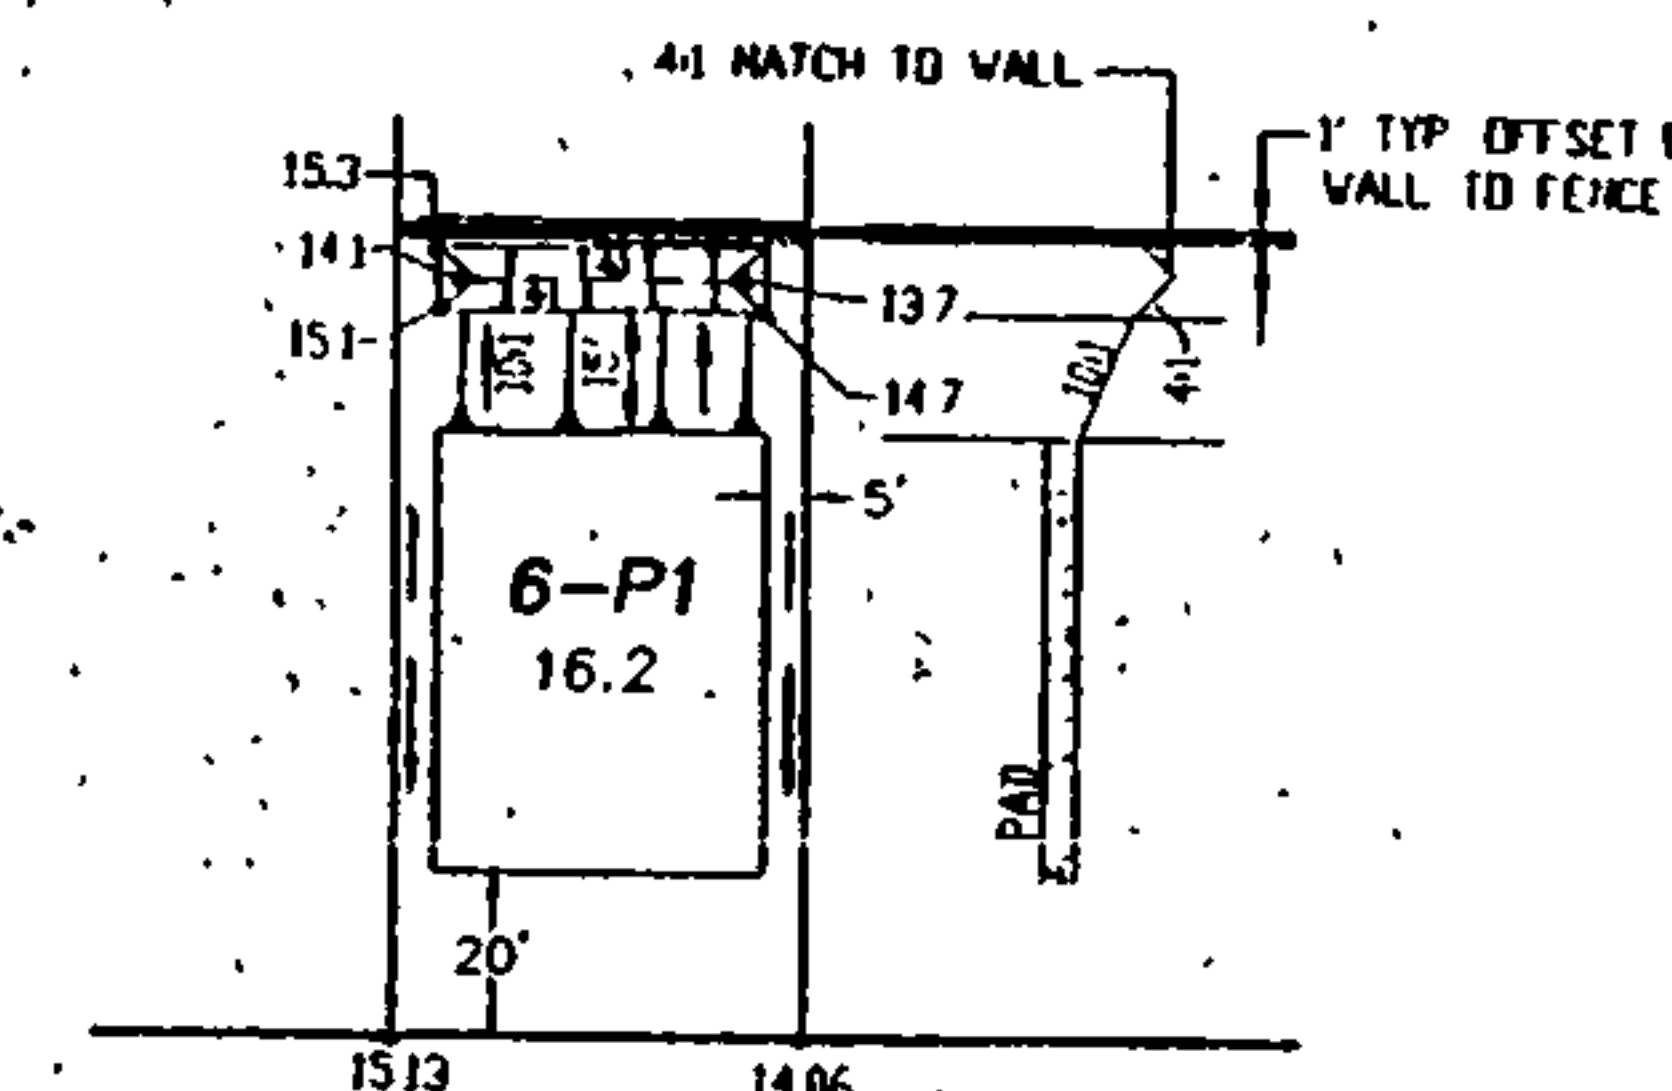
PRELIMINARY GRADING AND DRAINAGE PLAN FOR PARKWAY UNIT 7 COMPRISED OF UNPLATTED LANDS OF WESTLAND DEVELOPMENT CO., INC.
